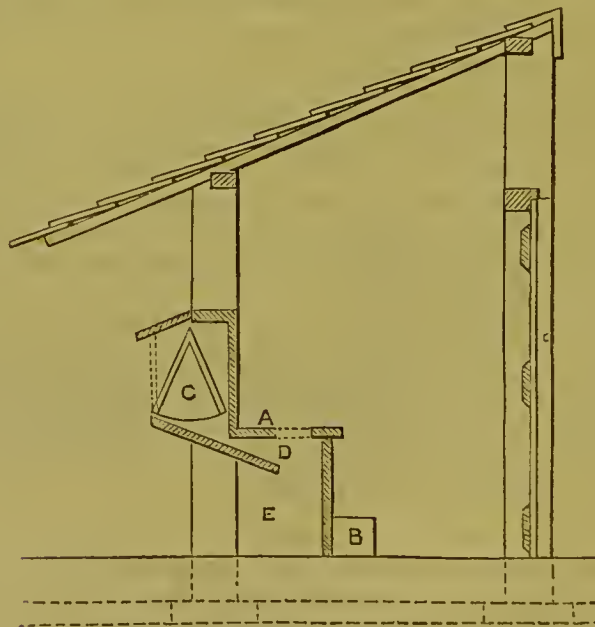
Section of Closet with External Distributor attached.—A, seat B, step; C, cinder sifter; D, ashes shoot; E, space for moveable receptacle.
